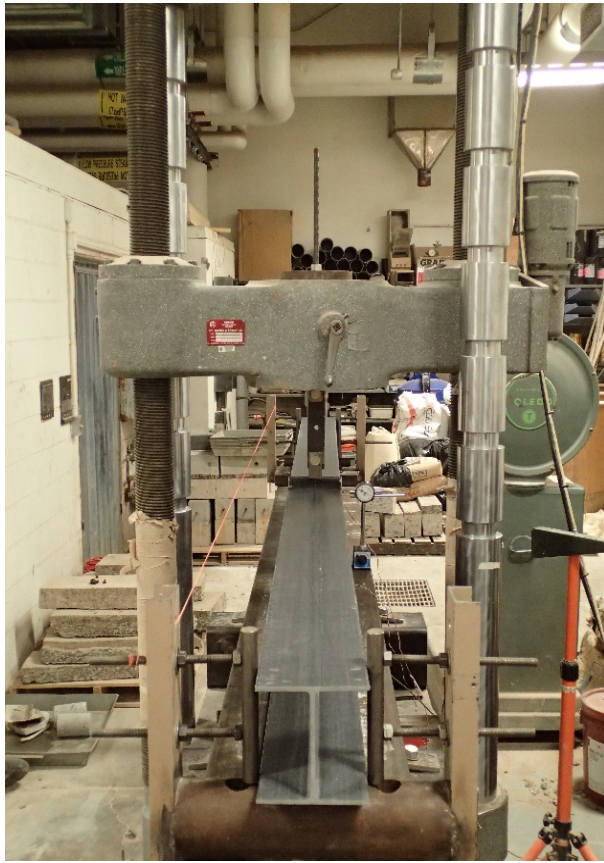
Strain gage layout on the compression flange for three-point bending tests
